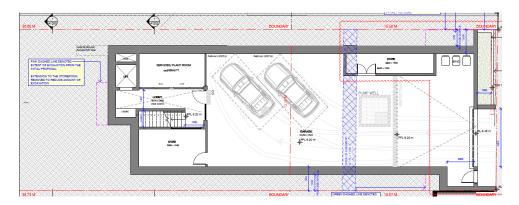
Proposed lower basement floor plan - 8 Victory Street, Clovelly (Source: BJB Architects Pty Ltd)
